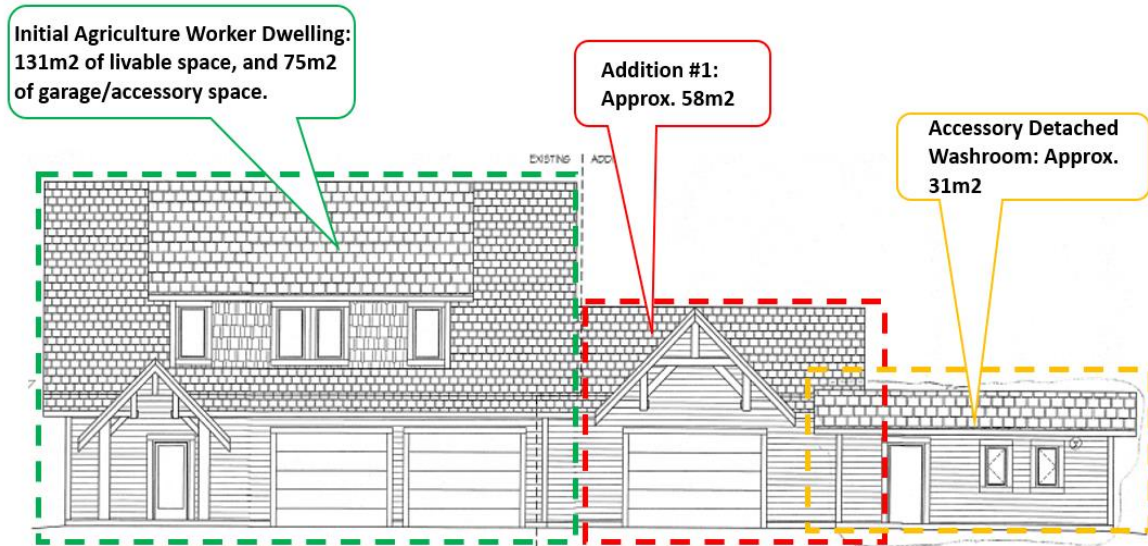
Existing Ag. Worker Dwelling and Detached Washroom
